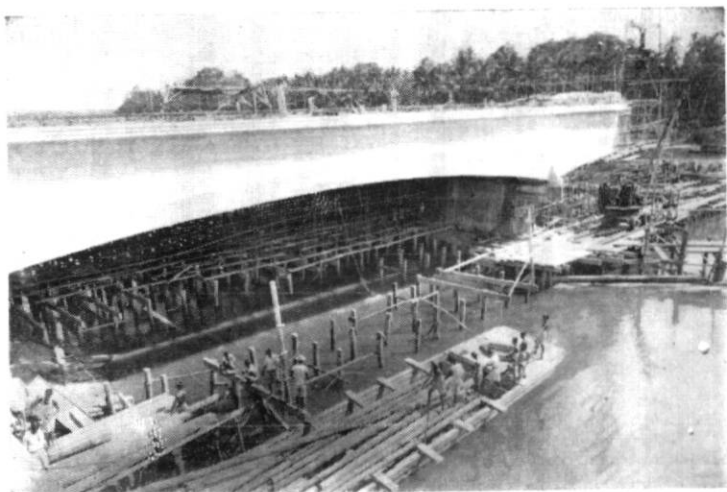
Fig. XIV. Extracting timber piles of temporary staging in river by a winch operated from the deck—4" x 4" holes provided in deck slab for wire rope.
